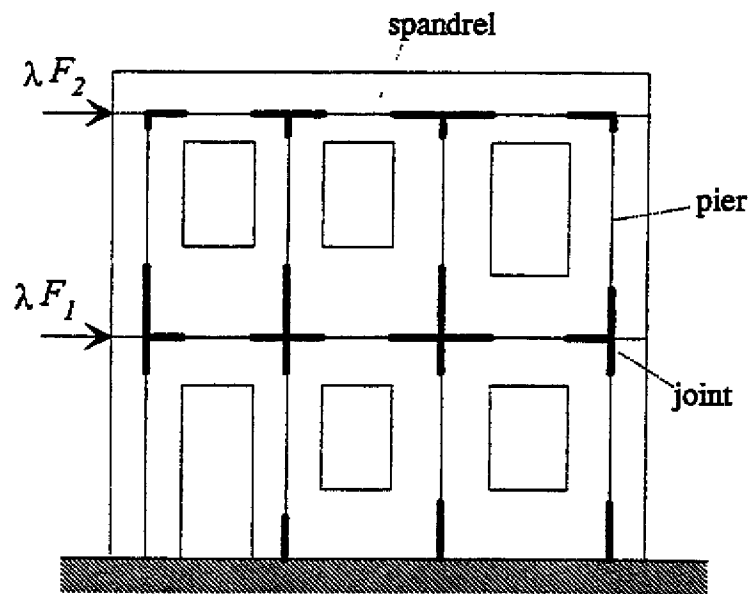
Equivalent frame idealization of a multistorey wall with opening
